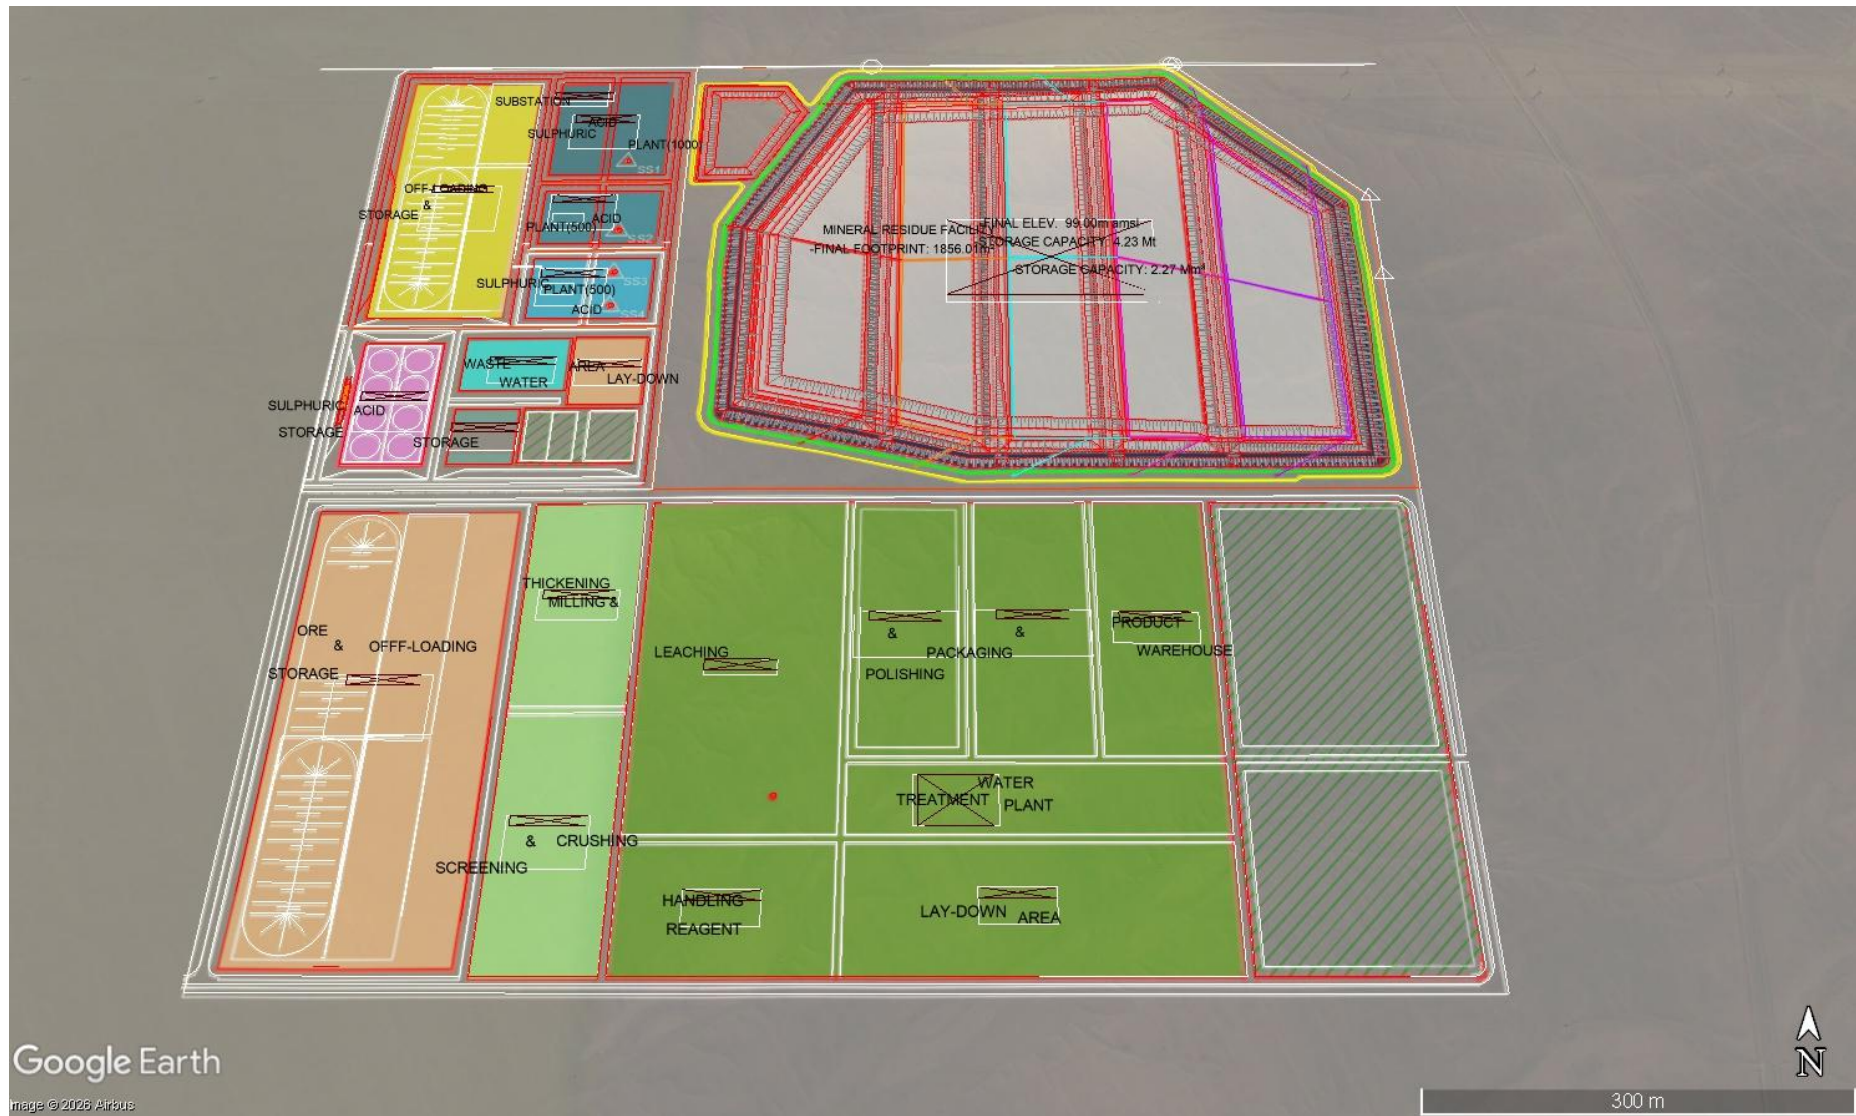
Site layout (as provided by GMR, 005-00-FS8P14RpGe.kmz). The red dots are the location of the stacks.
